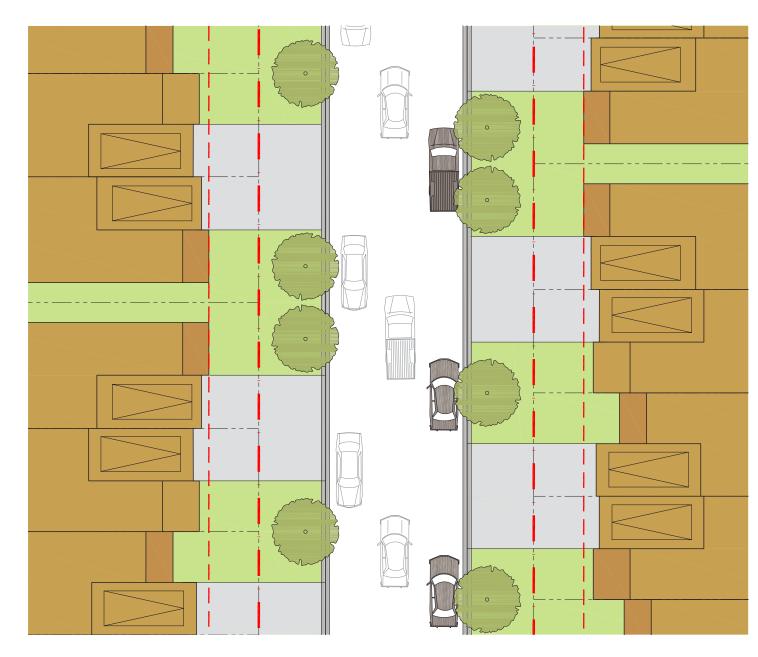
Front Drive Townhomes On-Street Parking Configuration
